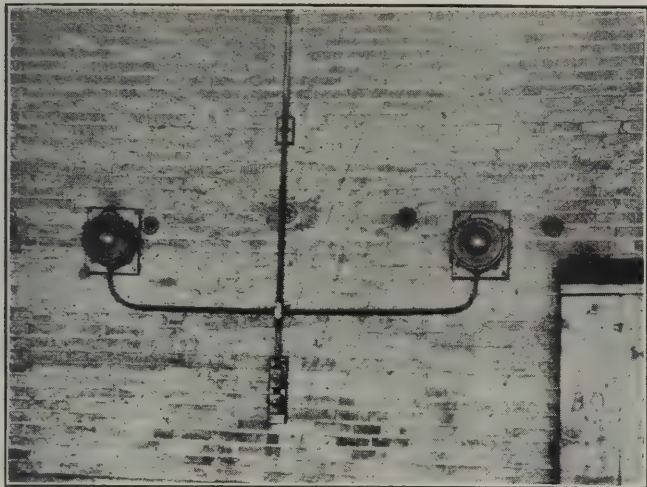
The Reflectors on the Outer Circle Wall Are Mounted in Pairs at a Slight Angle to the Wall so that the Beams of Light are Crossed
